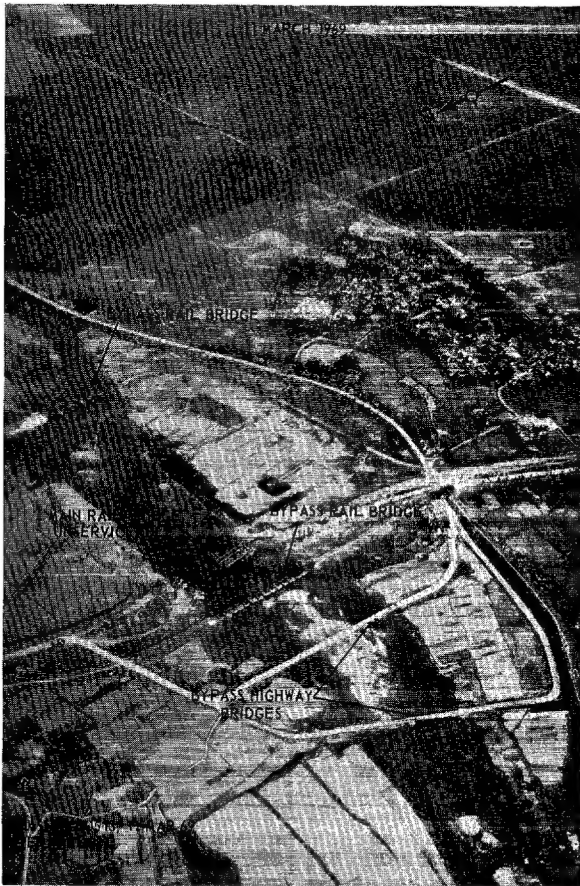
PHUONG DINH RAILROAD AND HIGHWAY BRIDGE OVER THE LACH TRUONG
